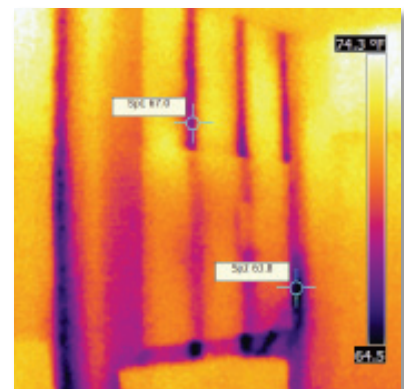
Thermal Bridging of Metal Wall Studs (interior)
